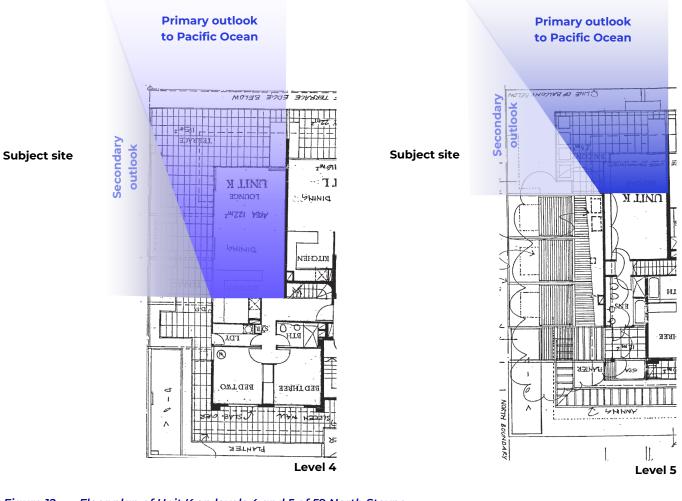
Floor plan of Unit K on levels 4 and 5 of 59 North Steyne
